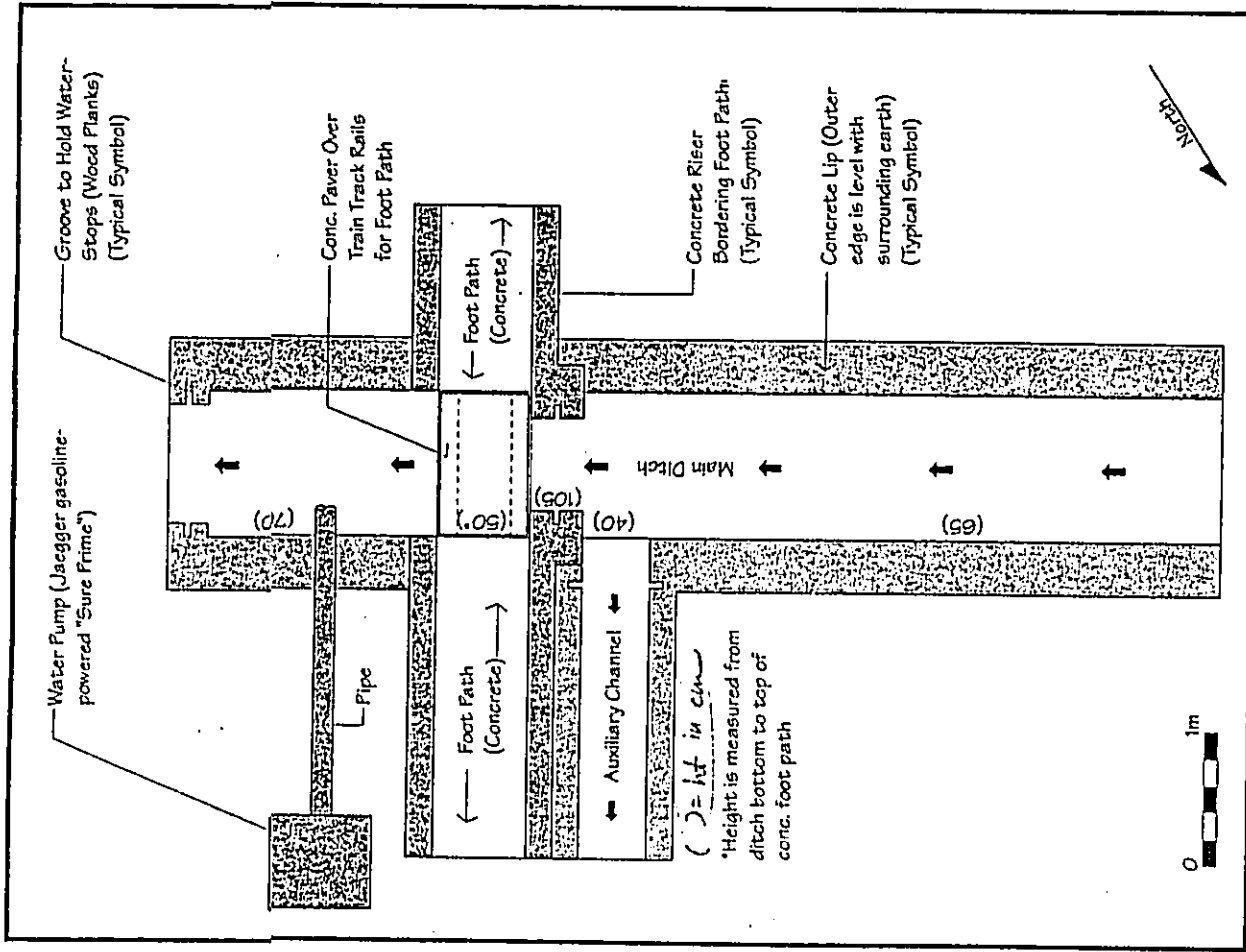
Plan View of Water Diversion Feature on Tai Lee Ditch (Pump Ditch/Reservoir Ditch)
